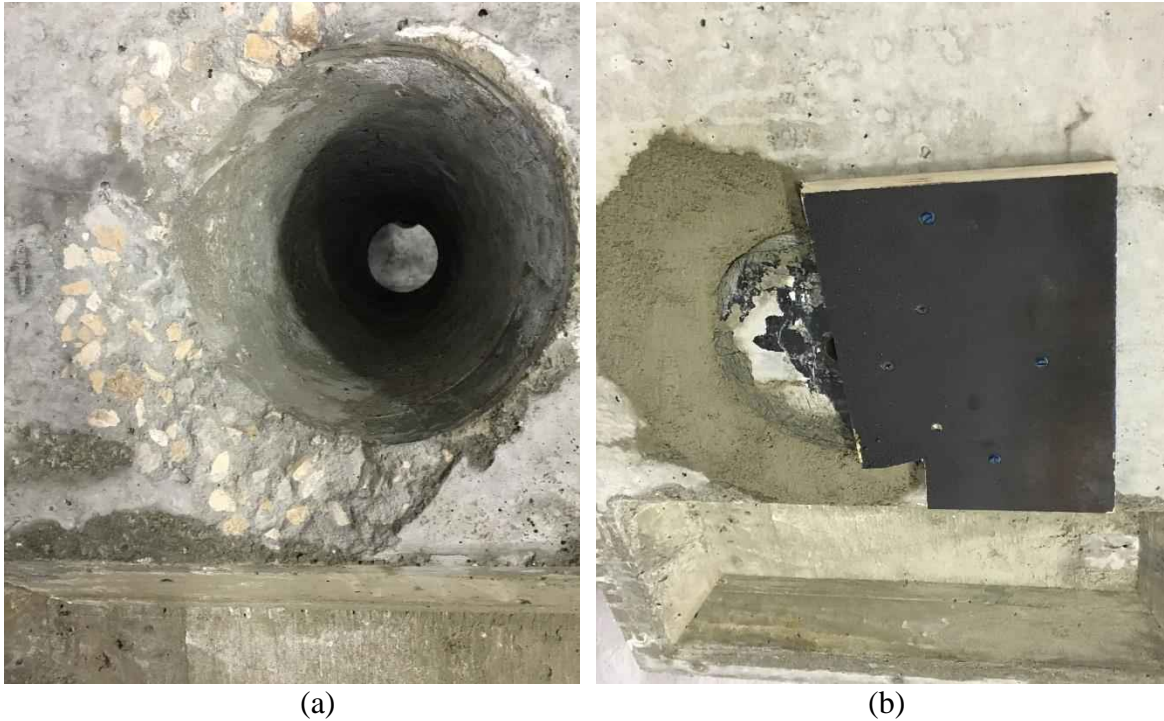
Specimen F1 after formwork removal (a) concrete spalling and (b) concrete repair
